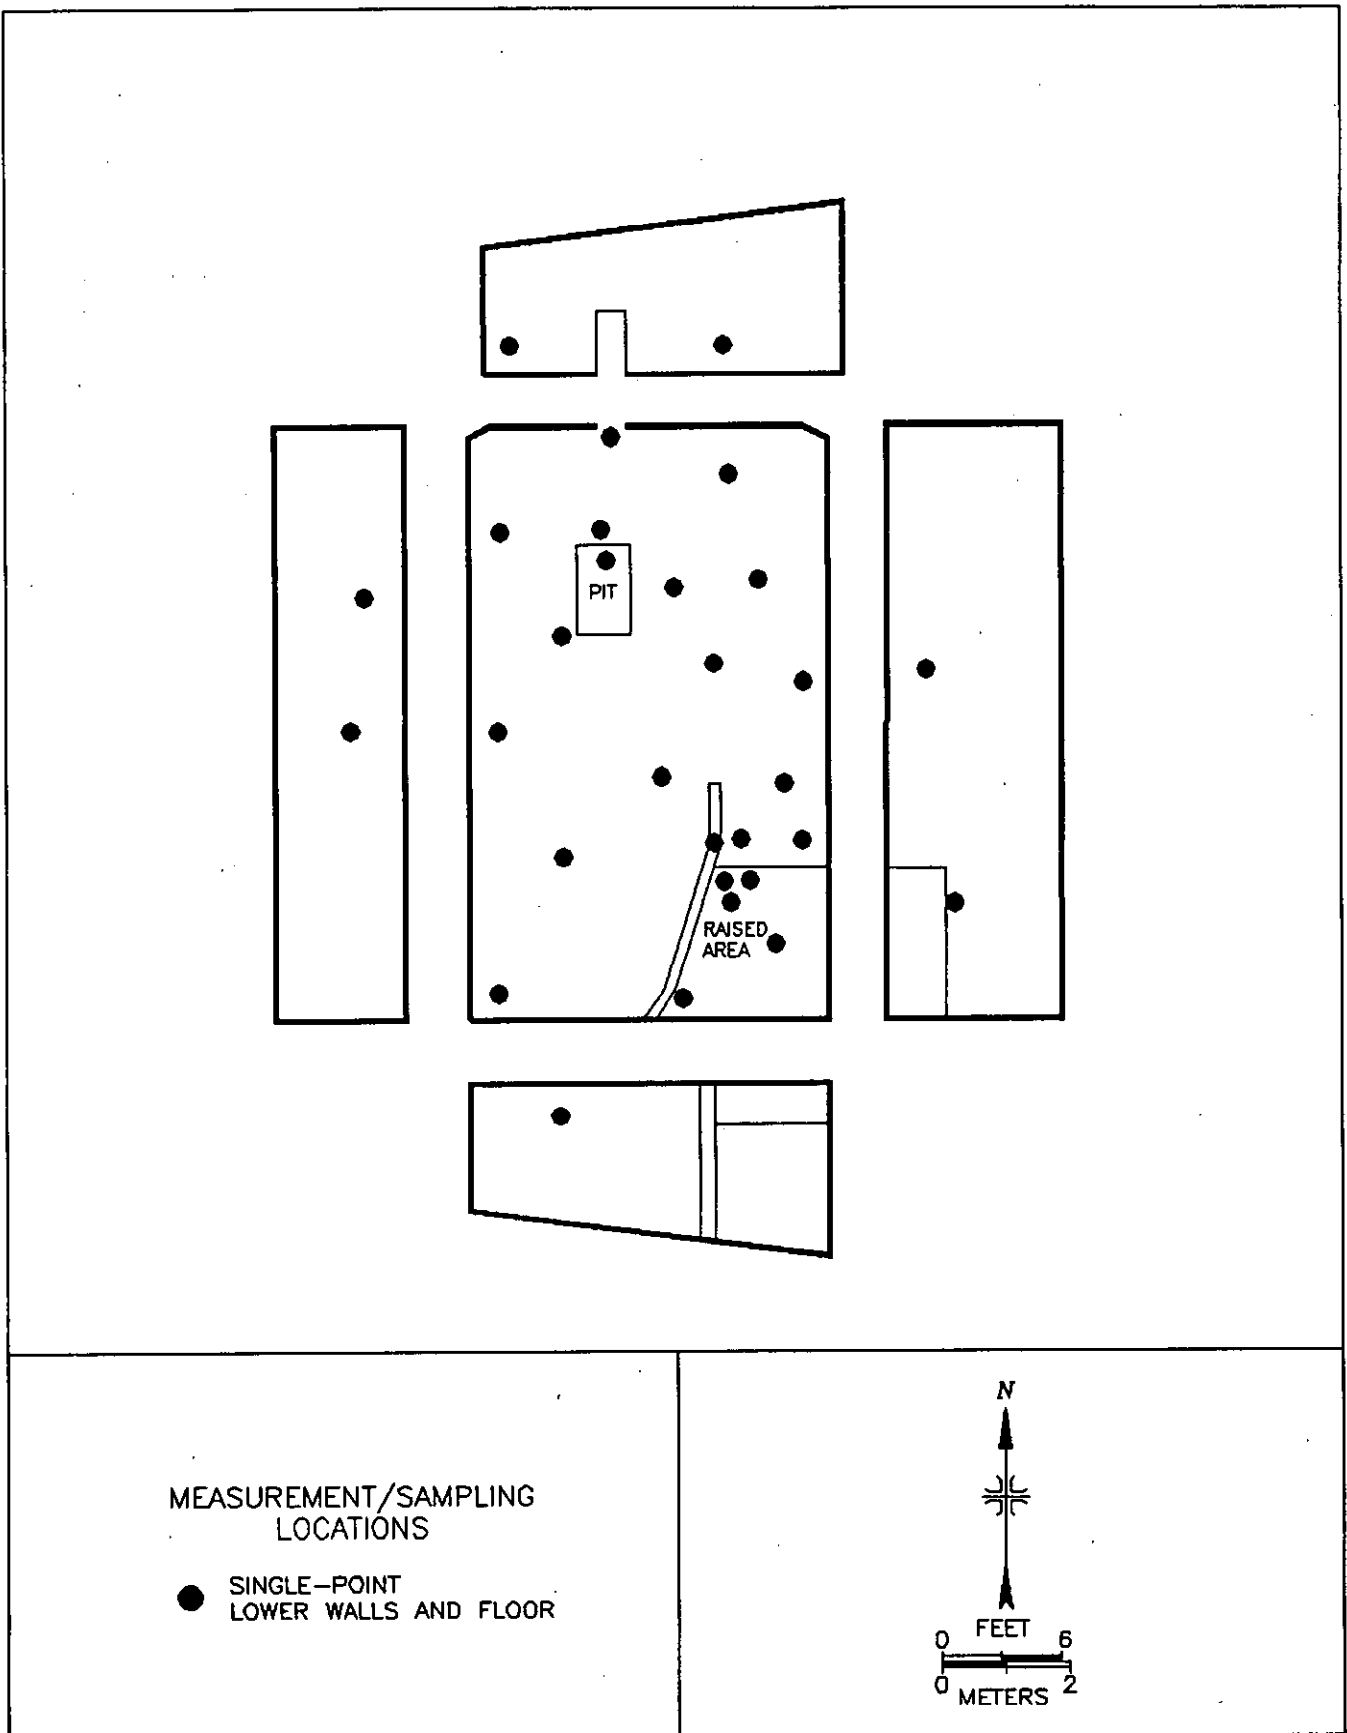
Gun Forging Machine Building - Floor and Lower Wall Measurement and Sampling Locations
